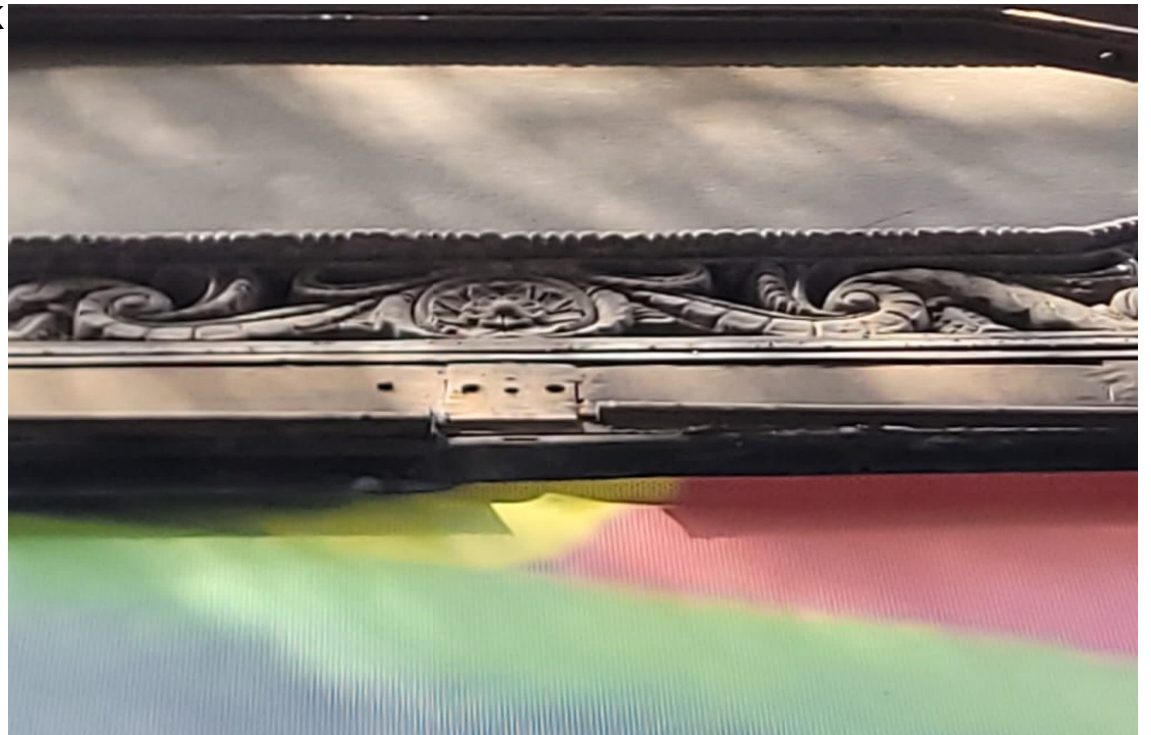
EXISTING STOREFRONT SYSTEM FRAMING
